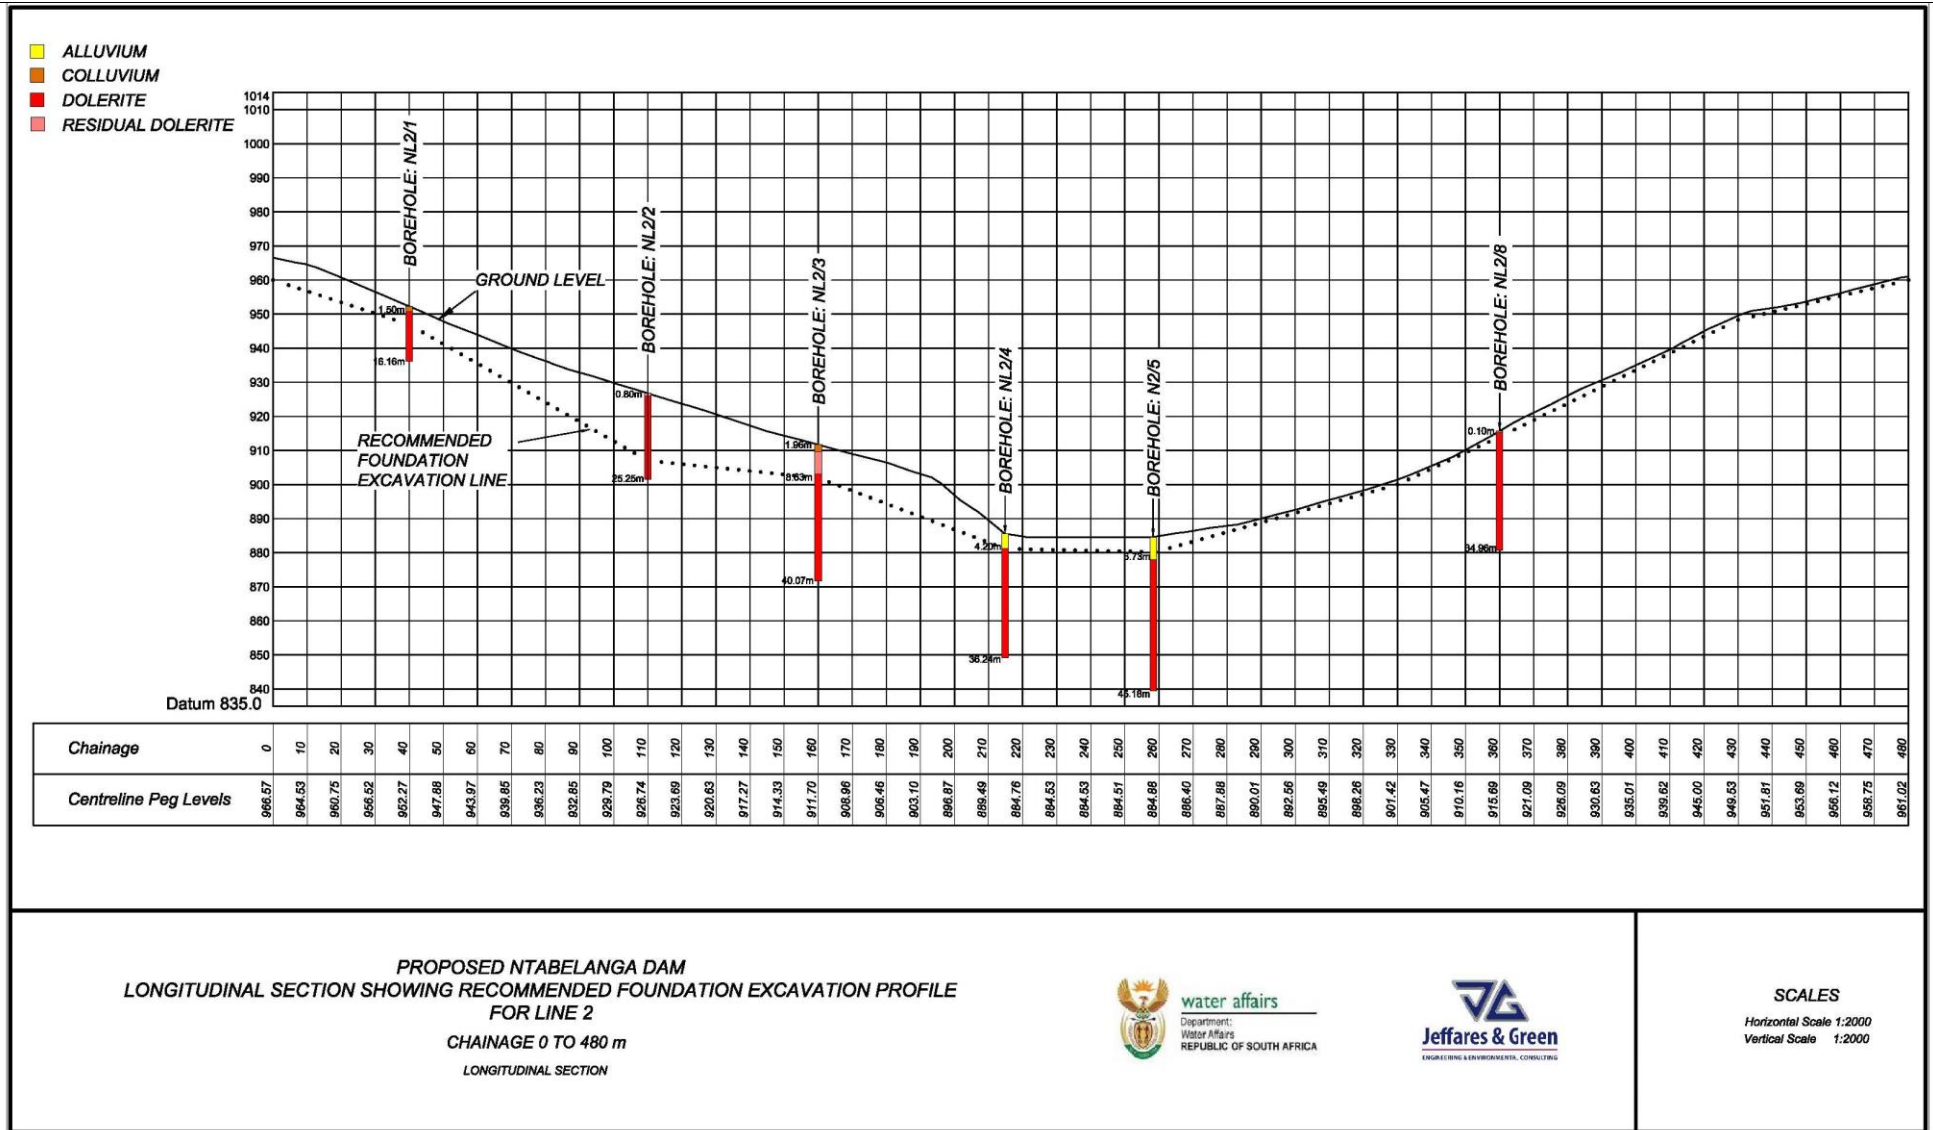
LS - Recommended Foundation Excavation Profile for Line 2
